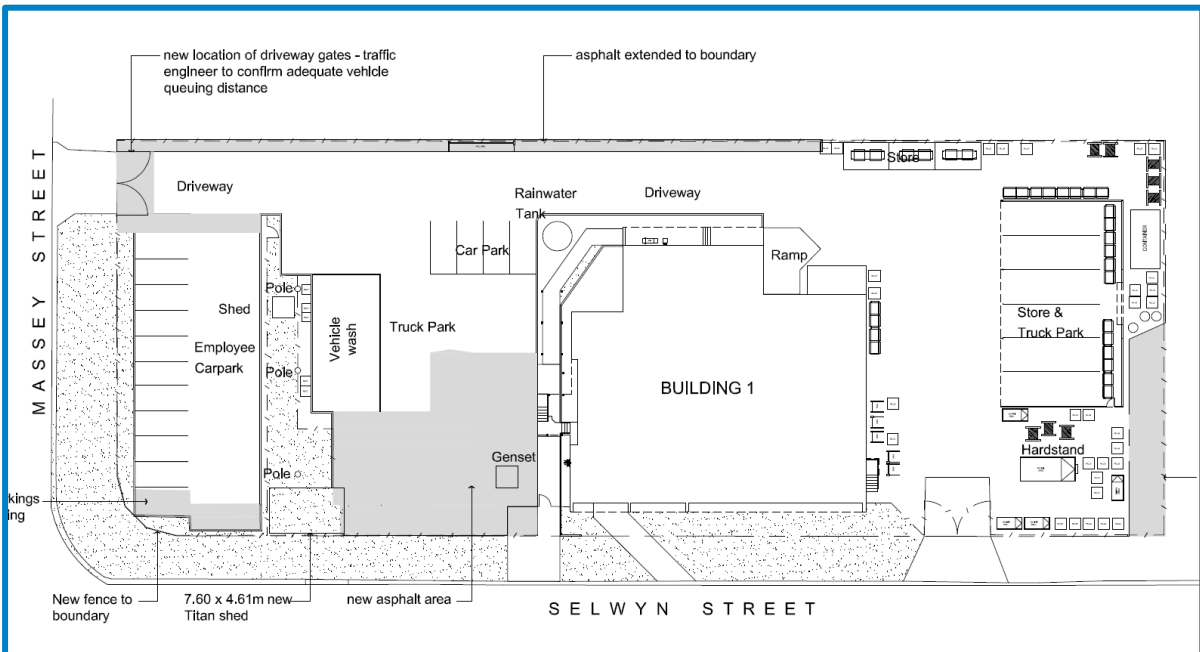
Plan showing a number of onsite improvements proposed for the facility.
